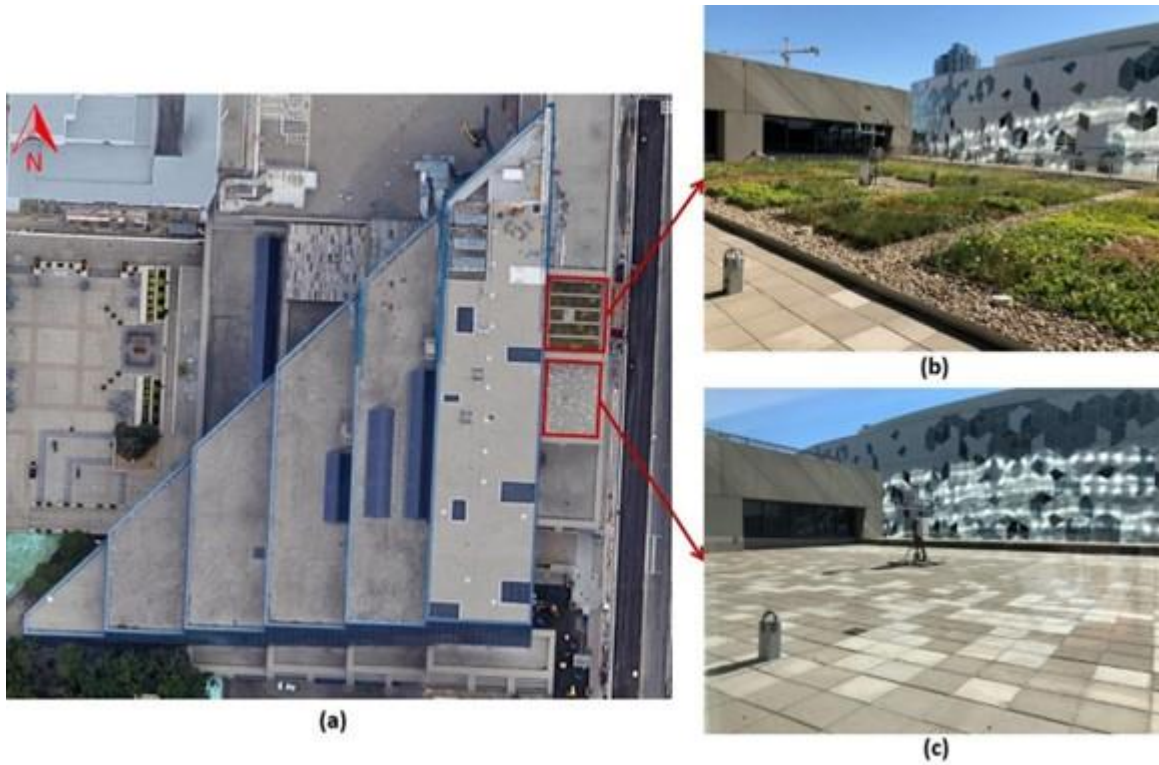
(a) Bird view of rooftops of Calgary's Municipal Building highlighting the locations of the study roofs, (b) the full-scale extensive green roof on the 5th floor, and (c) the reference roof on the 4th floor (Akther, 2020).
